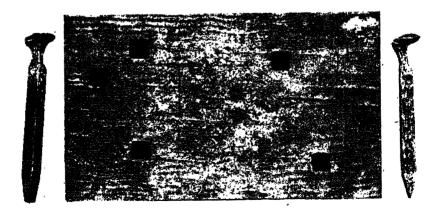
Showing Corrosion and Wear in Heads and Throats of Cut Spikes.
